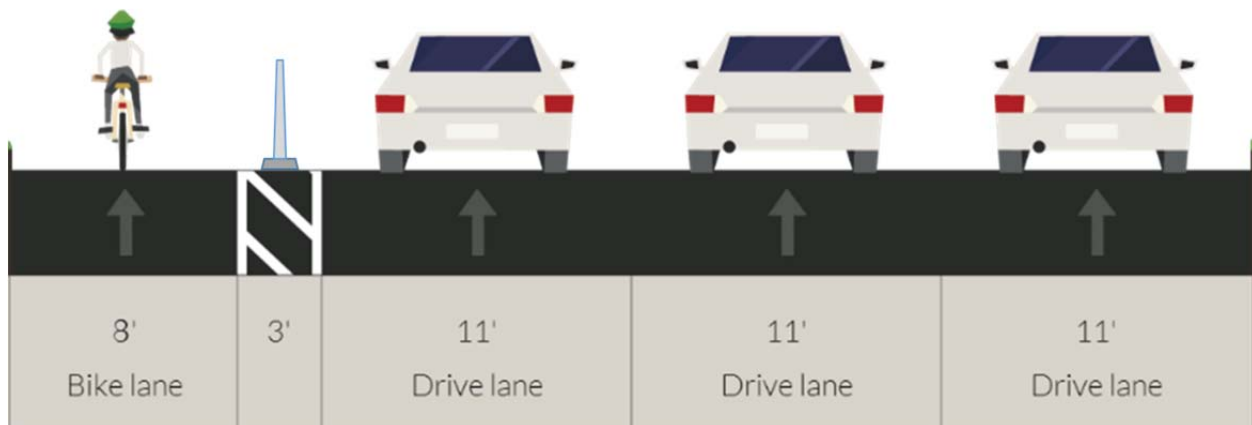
L Street Protected Bike Lane, Washington, D.C.
